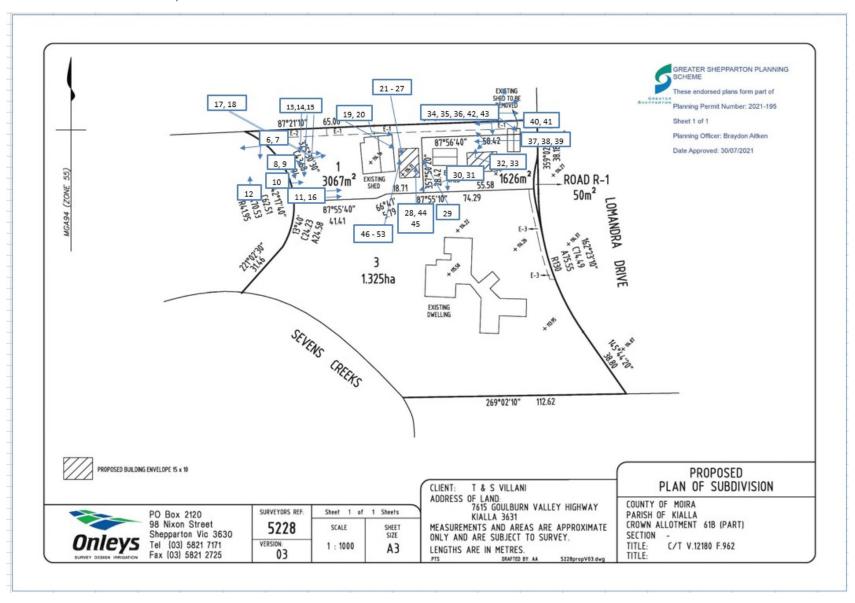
Photo location plan 2 (Photos 6-53) - 34 Lomandra Drive and surrounds, Kialla (Source - Endorsed Title documents)
